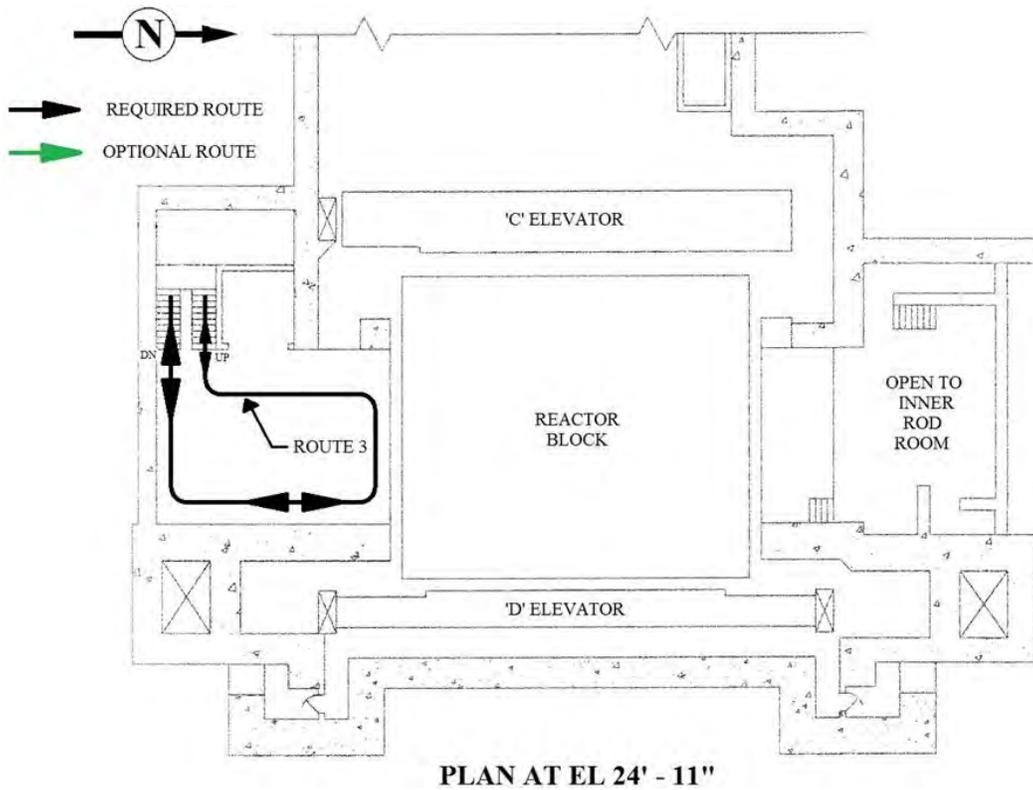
105-DR Safe Storage Enclosure Floor Plan Elevation 24 ft - 11 in.
